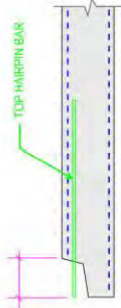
Typical cross-section at end of pre-cast slab panel. Indicating protruding top hairpin bar and rebate at end of panel.
